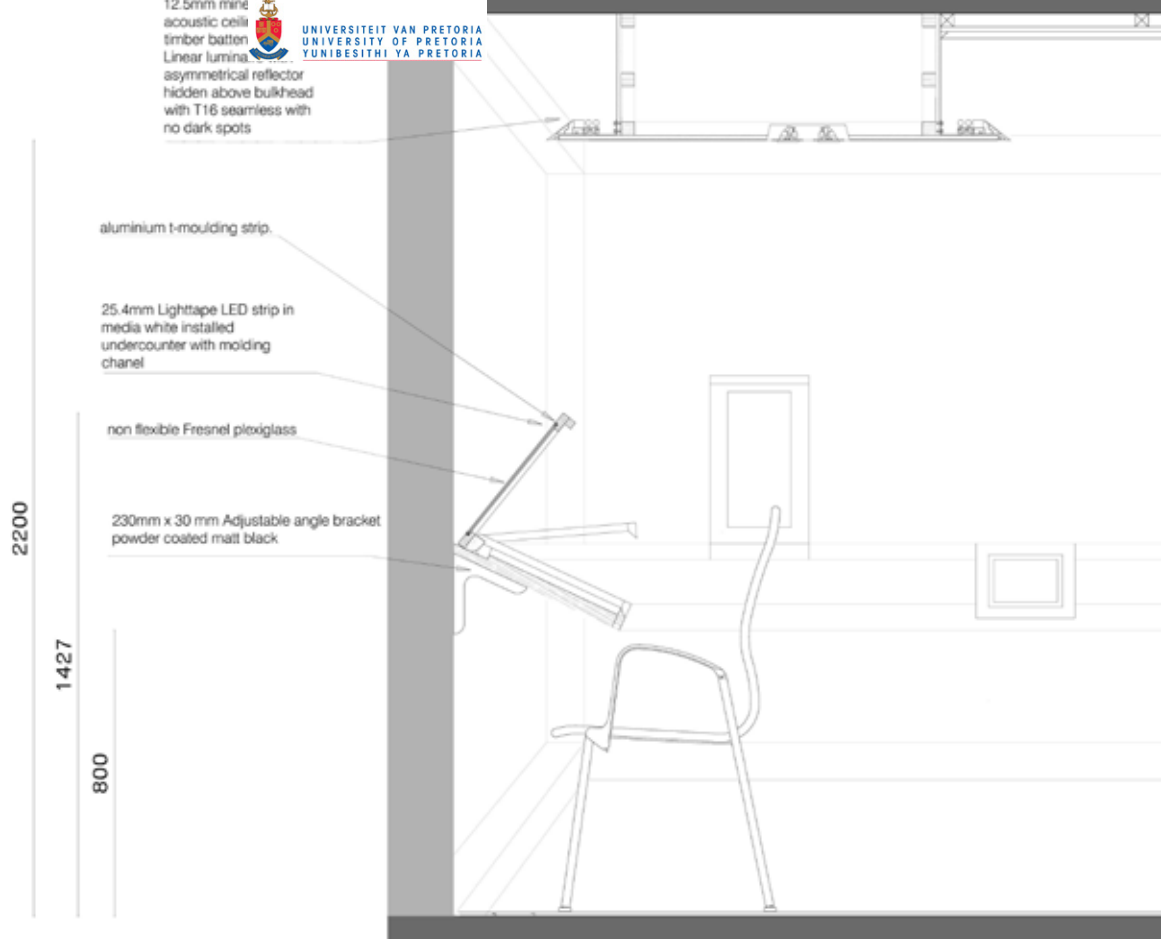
DETAIL: Work top, not to scale (Author, 2013)
